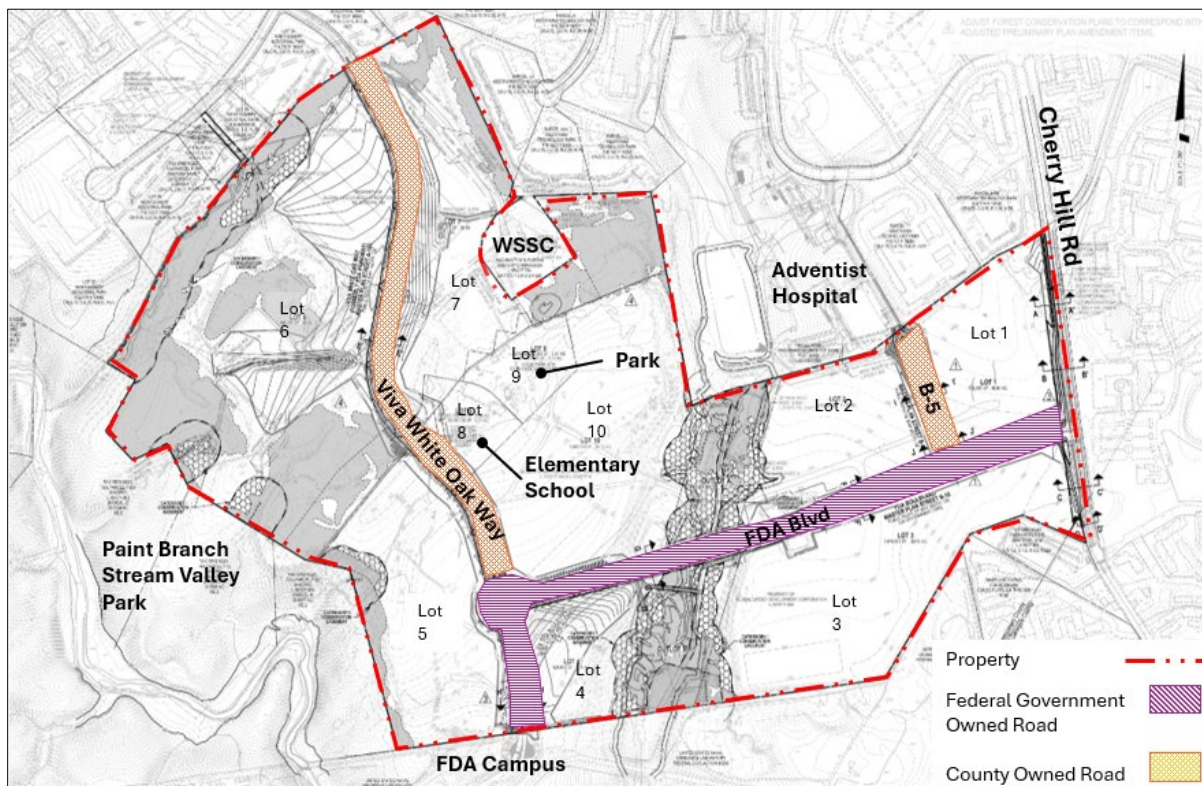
Preliminary Plan Amendment and Road Ownership (all lots are illustrative)
